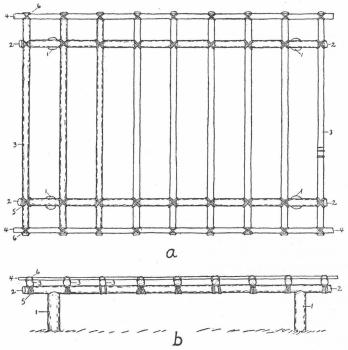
House framework: a, view from above; b, side view. 1, temporary posts; 2, longitudinal beams (hapai), 24 feet 3 inches long, 7 inches in diameter, laid parallel 12.5 feet apart; 3, crossbeams (vae), 17 feet 4 inches long, 5 inches in diameter, ends project 2 feet 5 inches on each side beyond longitudinal beams; 4, wall plates (haupapa), 25 feet 2 inches long, 4 inches wide, and 1 inch thick; 5, lashing of crossbeams to longitudinal beams; 6, lashing of wall plate to crossbeams.
